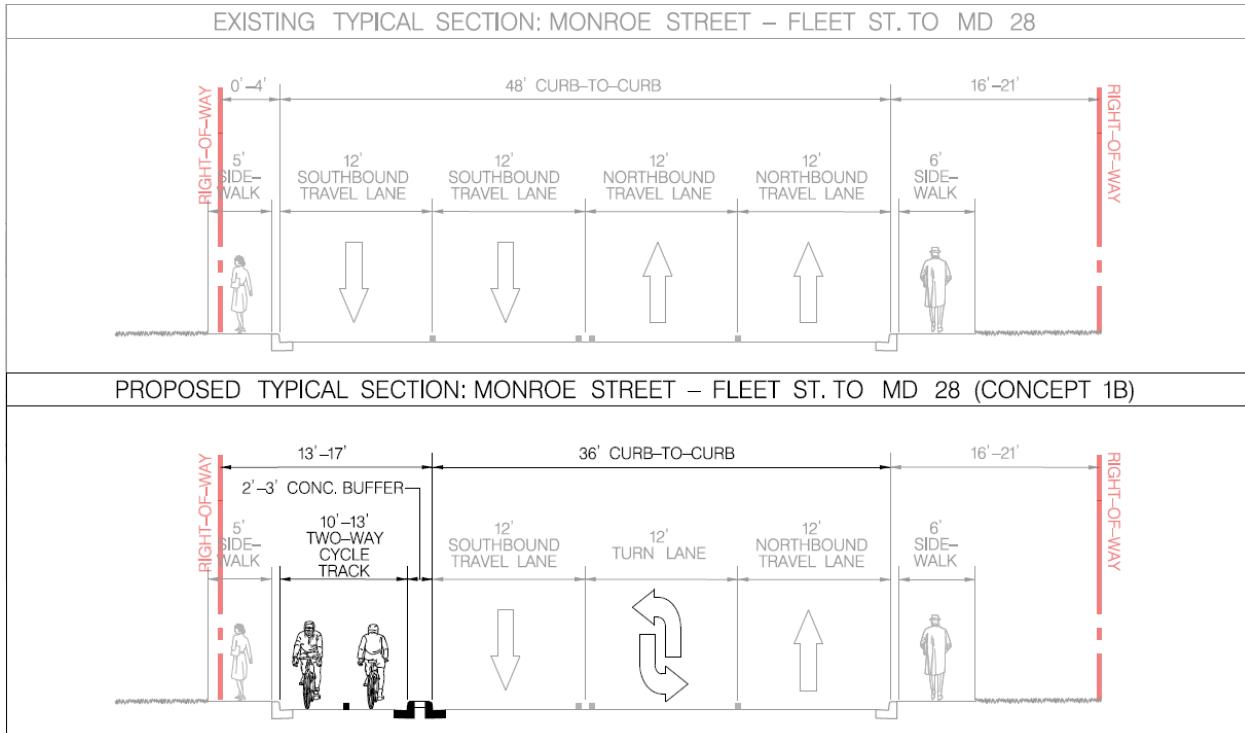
Existing and proposed typical section for on-street two-way cycle track option.
